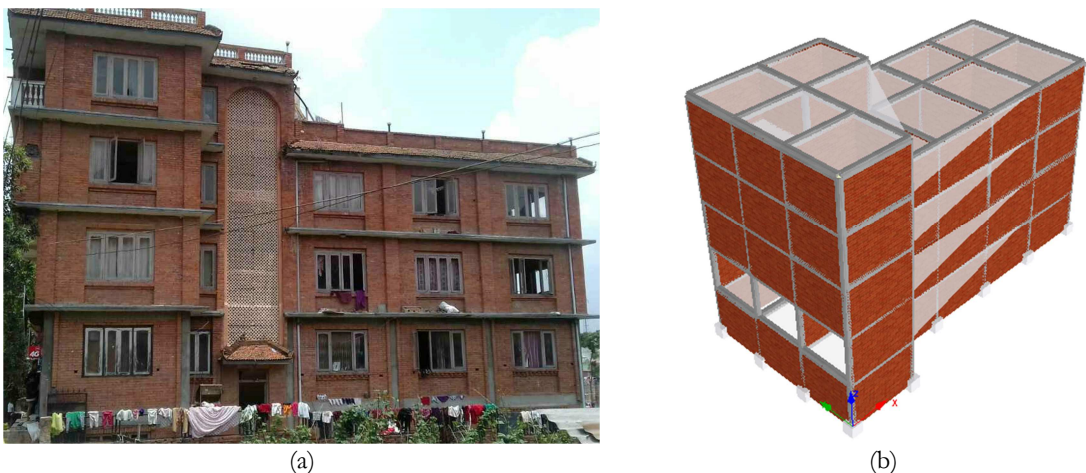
MRT2 building; (a) Real building and (b) Numerical model
